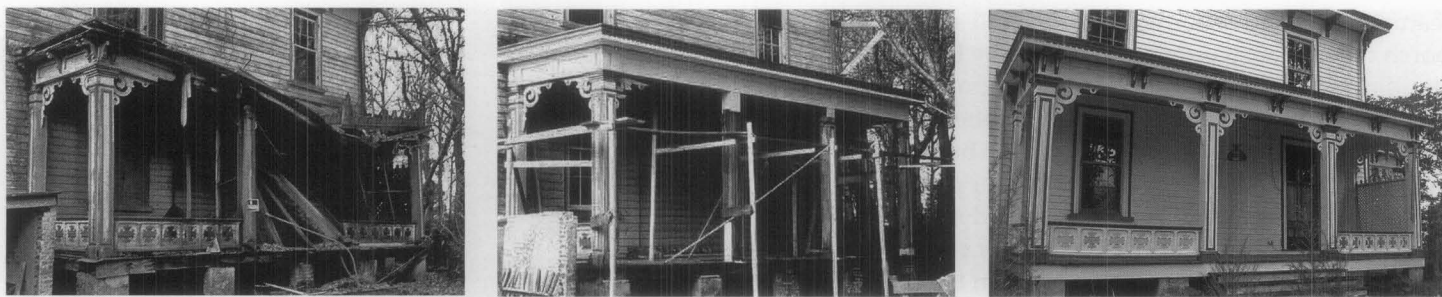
Even historic porches that appear to be in total disrepair may be repairable. While the roof needed replacement, much of this porch was repaired, including such features as the decorative columns, ornamental brackets, and balustrade. Photos: John Leeke.
